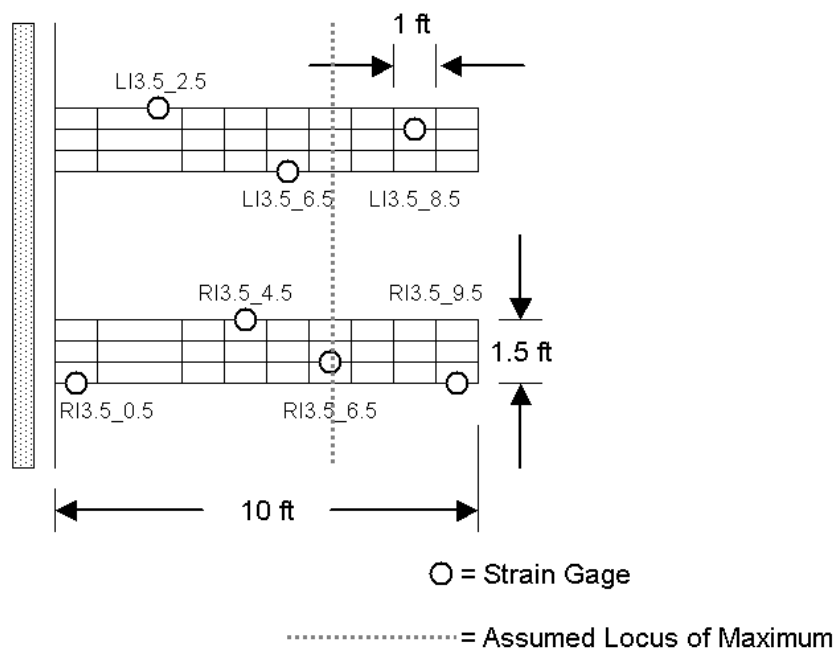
Plan view of instrumented intermediate bar mat IL3.5 at level 3.5 located in the intermediate and primary reinforced section.
